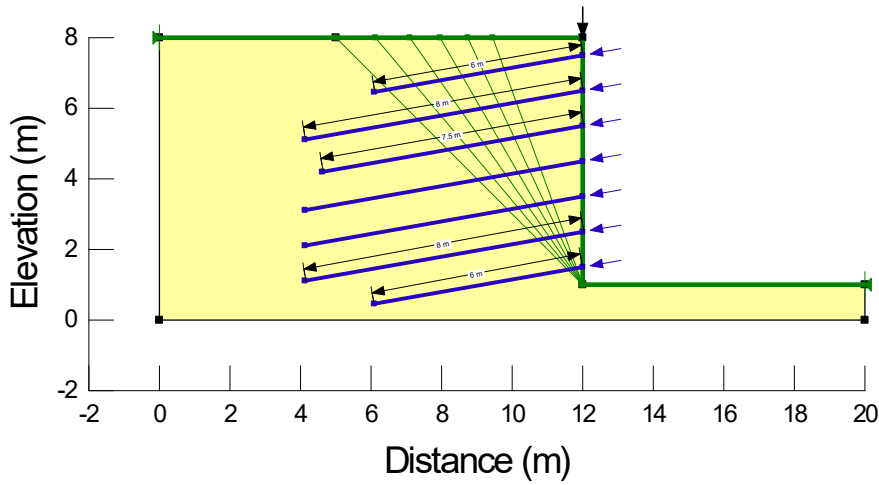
Geometry of the Sheahan Clouterre Test Wall model
